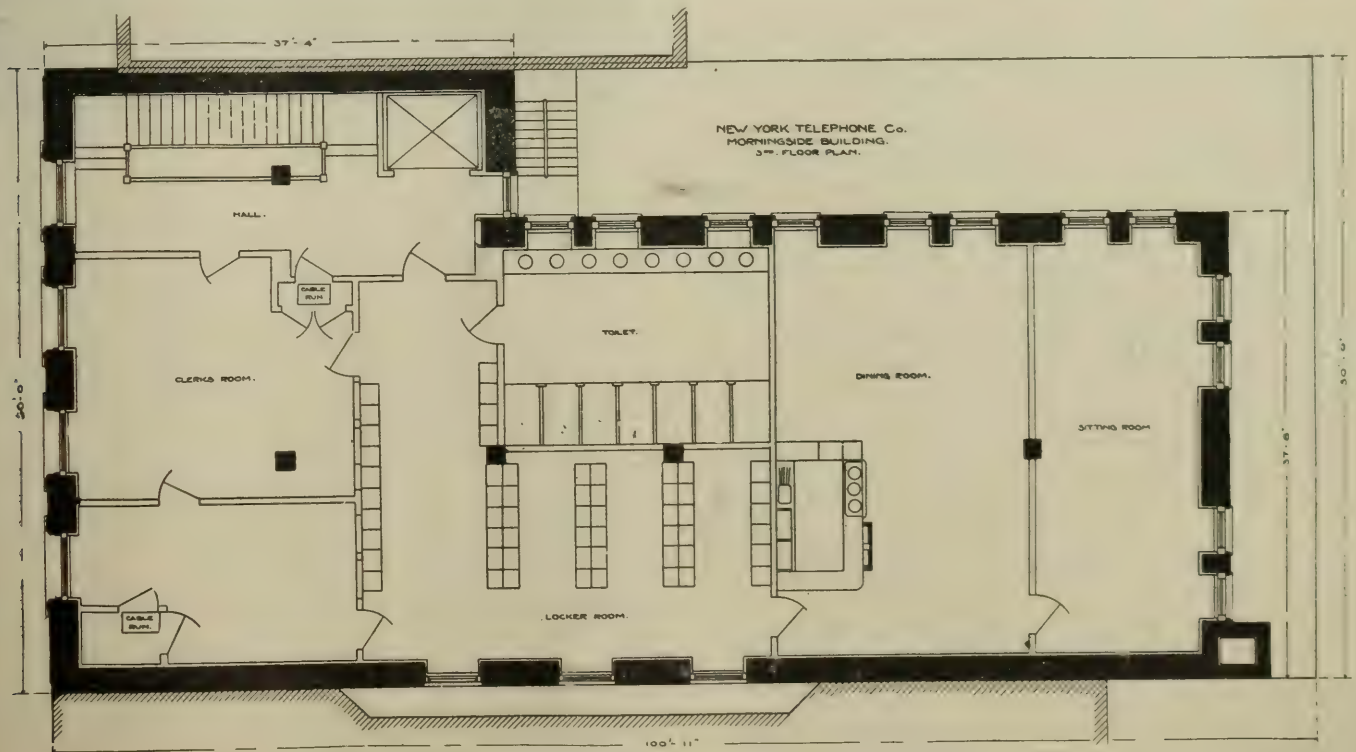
PLAN OF THIRD FLOOR, MORNINGSIDE BUILDING.
